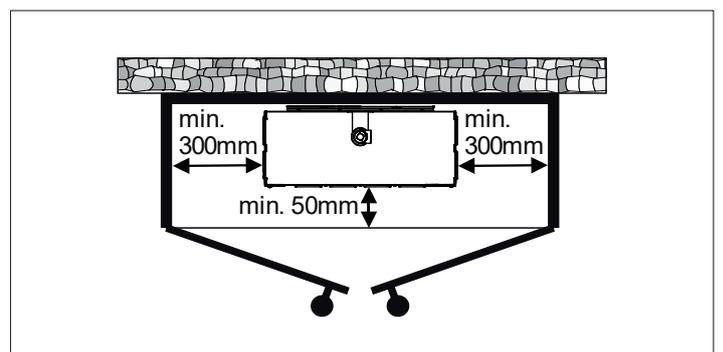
Minimum dimensions for positioning steam generator inside a ventilated cabinet
